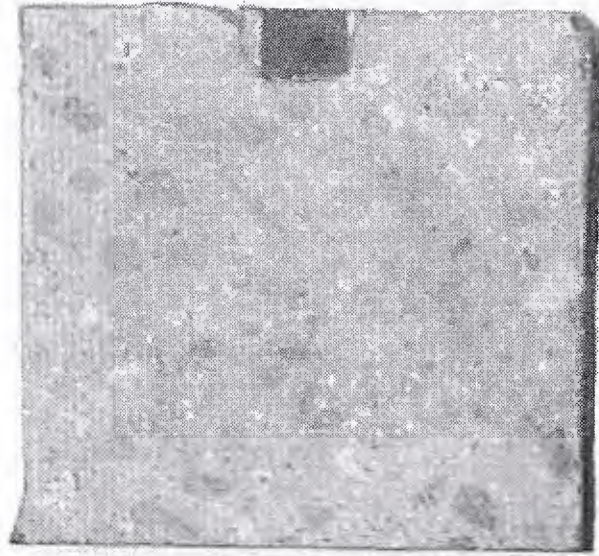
Cross section slice of beam specimen after 1000 thermal cycles.
